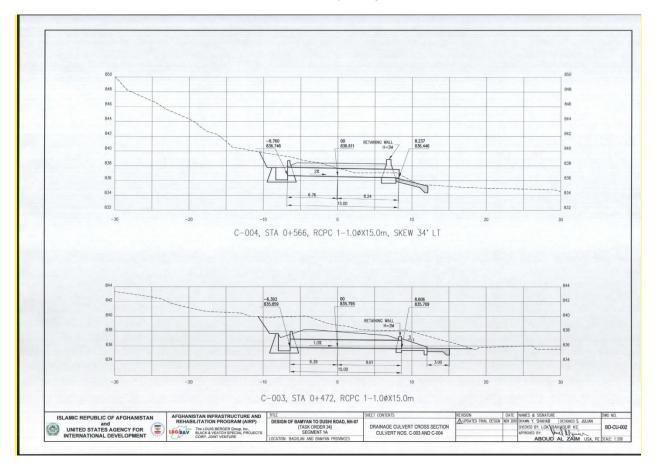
Drainage Culverts Cross section, Culvers NOS. C-003 and C-004
